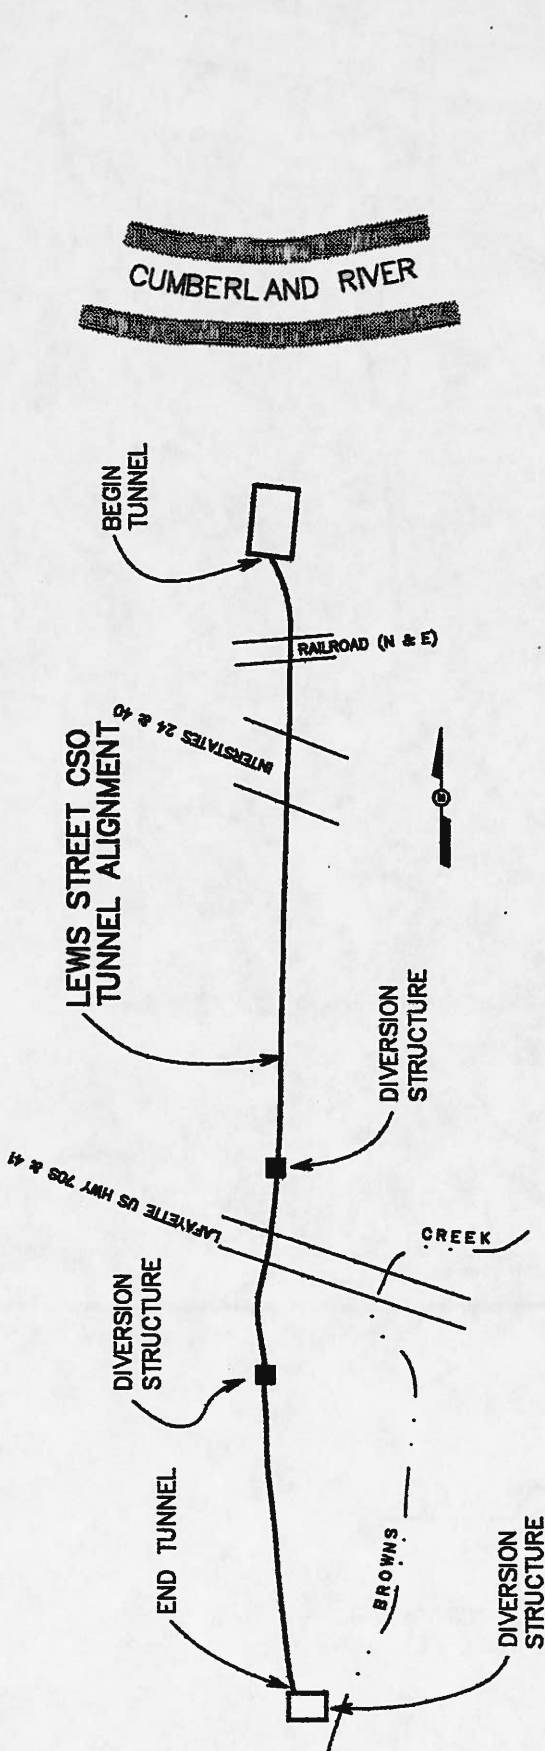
TUNNEL ALIGNMENT PLAN
